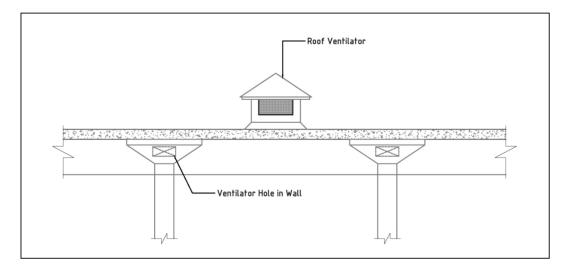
Typical Roof Ventilator (MWA, 1994)
